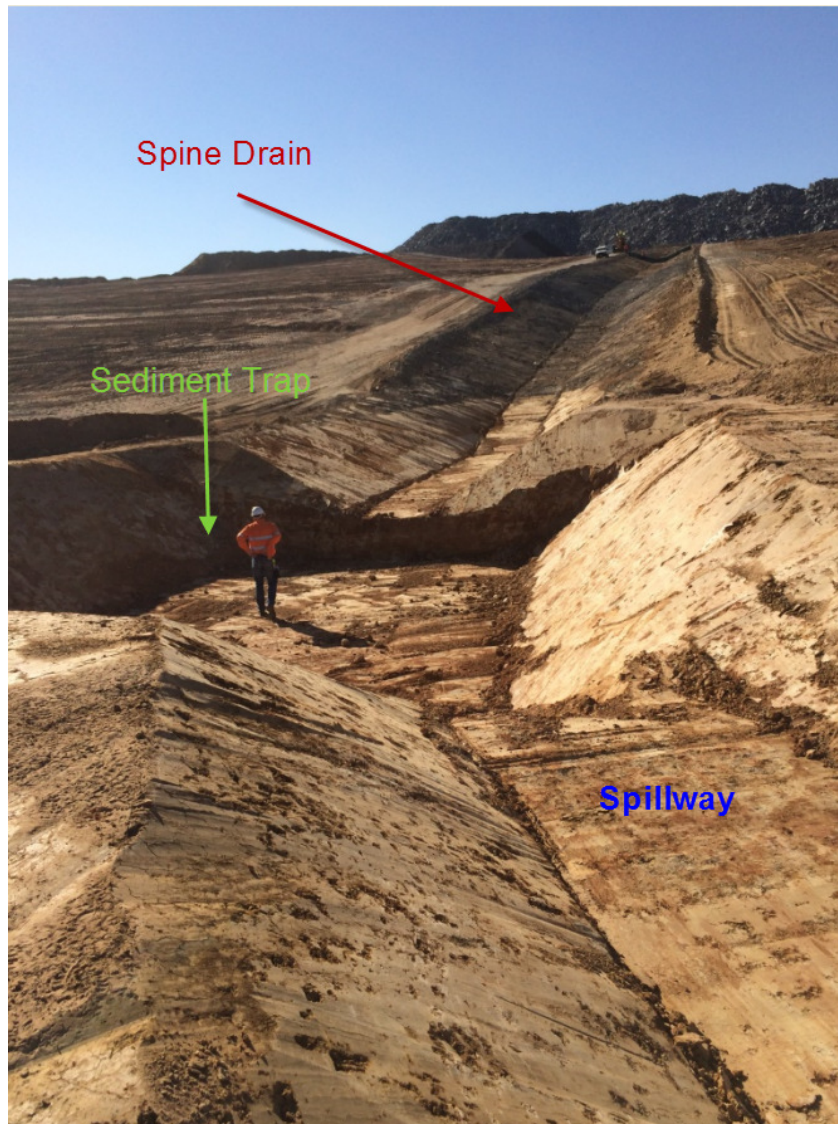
East Pit Spine, Sump and Spillway pre Rock.
